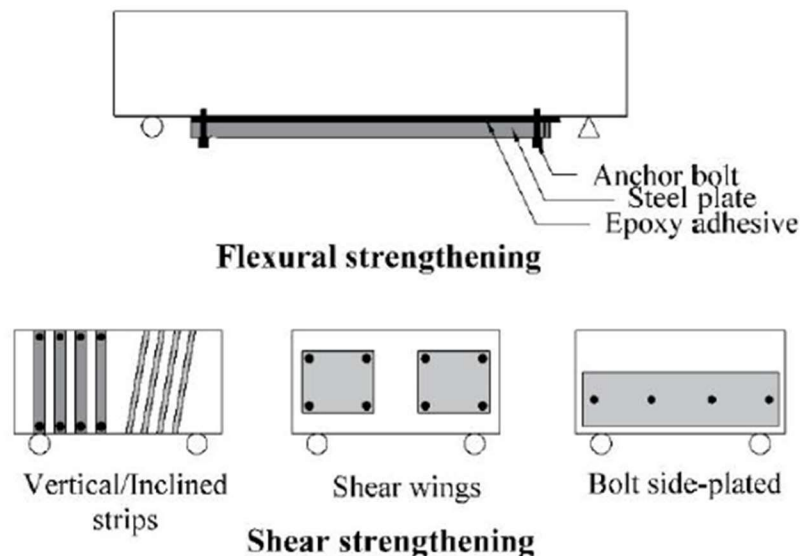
Example of Strengthening Using Externally Bonded Steel Plates (Adhikary & Mutsuyoshi, 2006)
